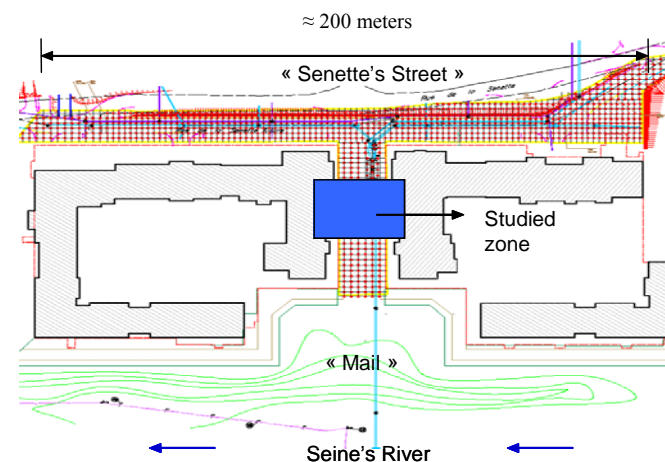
Residential Building Project at Carrières sous Poissy. Rigid piles treated zones.
